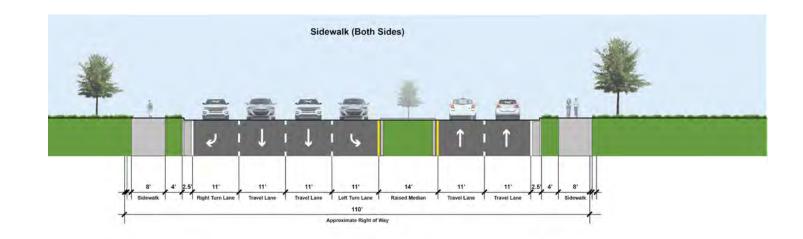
presents the 5th Street cross-section alternatives south of I-64 to Old Lynchburg Road.
